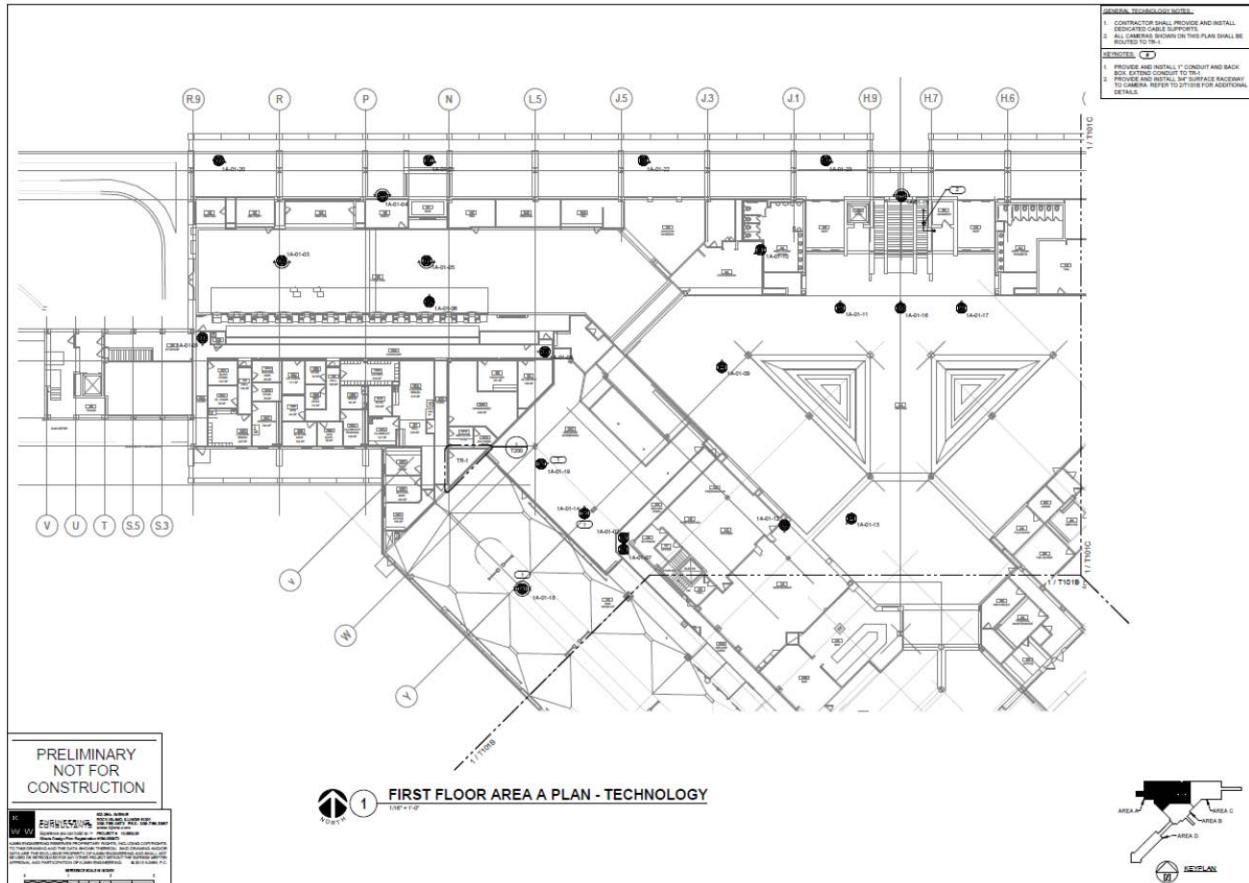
REPLACE CCTV SITE PLAN
